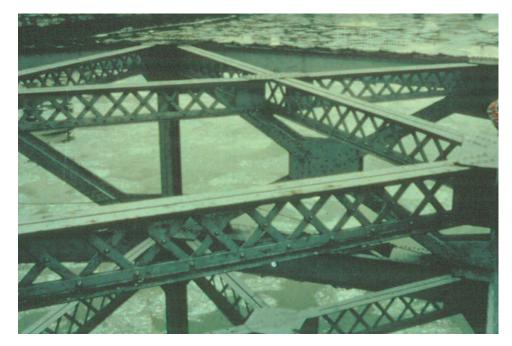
Bracing Members Made from Angles, Bars, and Plates
